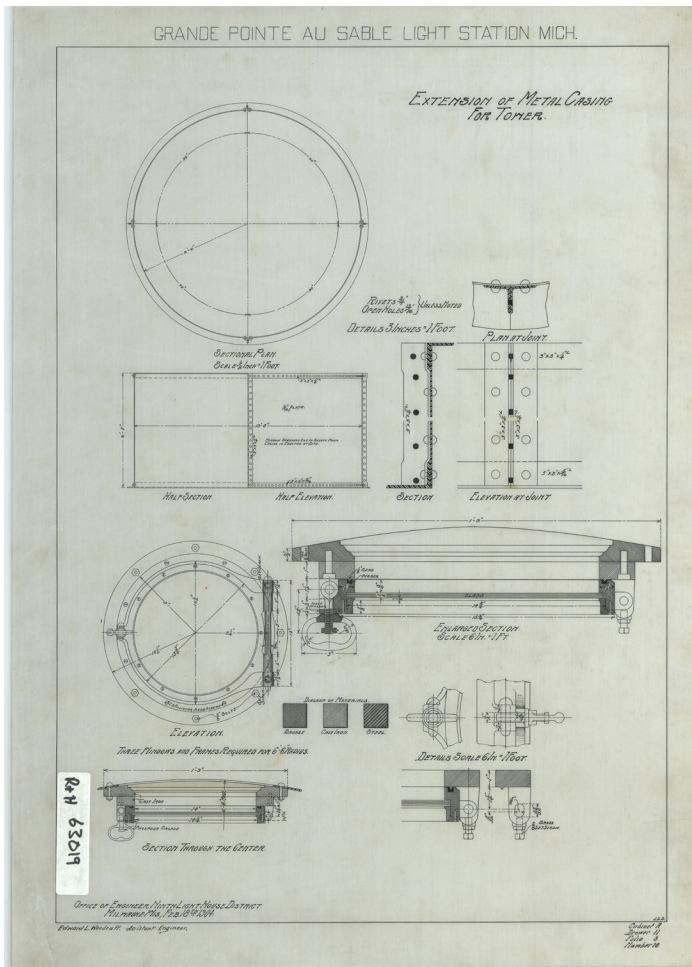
B-18: 1904 drawings for extension of the metal cladding and circular, porthole-style windows at the tower watchroom level.
